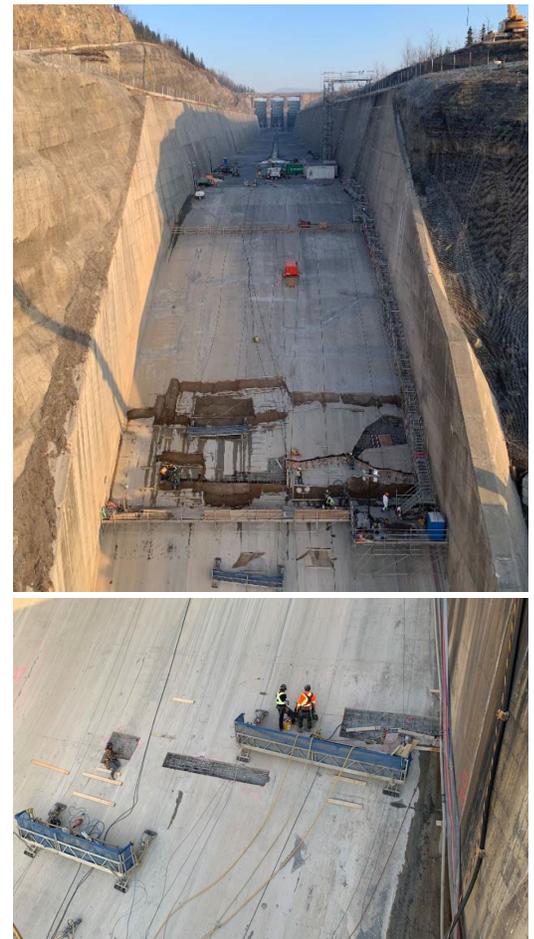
Concrete removal and replacement work in the WAC Bennett spillway.
